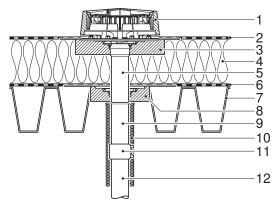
Installation in a lightweight roof insulated with roof foil and vapour barrier connection
